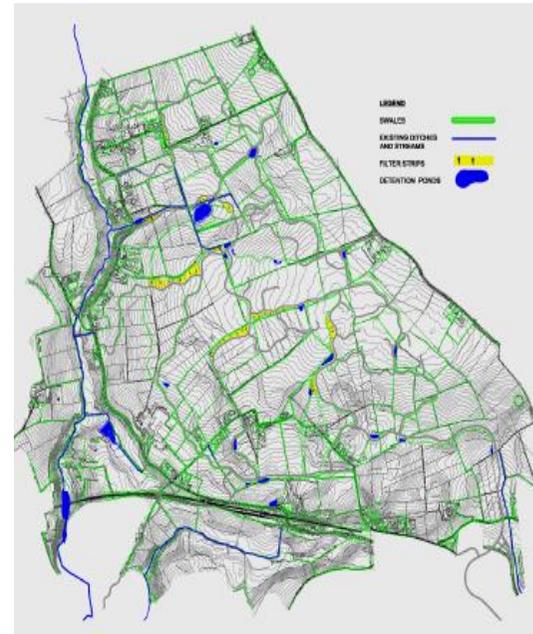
Proposed Swales, Detention Ponds and Filter Strips
